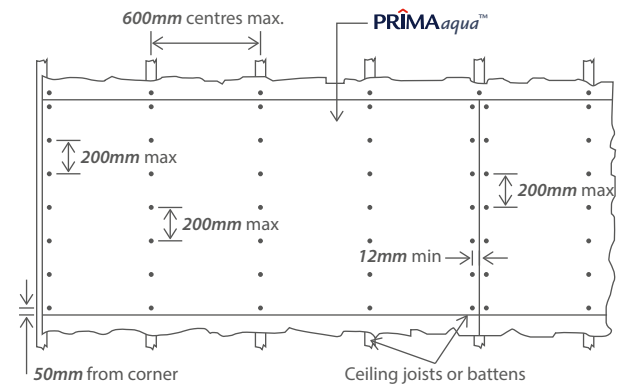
PRIMA^{aqua}™ Ceiling - Nail or Screw Fixed
